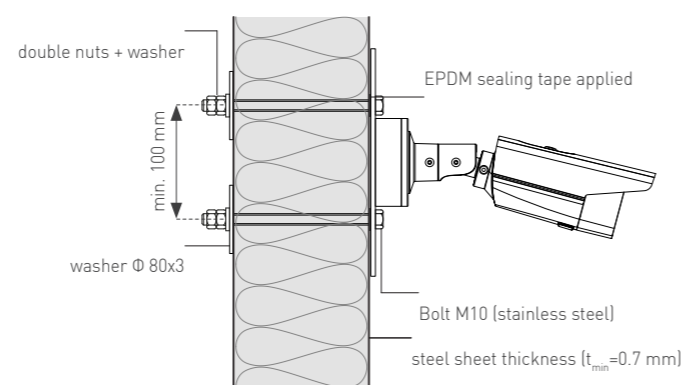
Fastening through the panel with M10 bolts (stainless steel).
